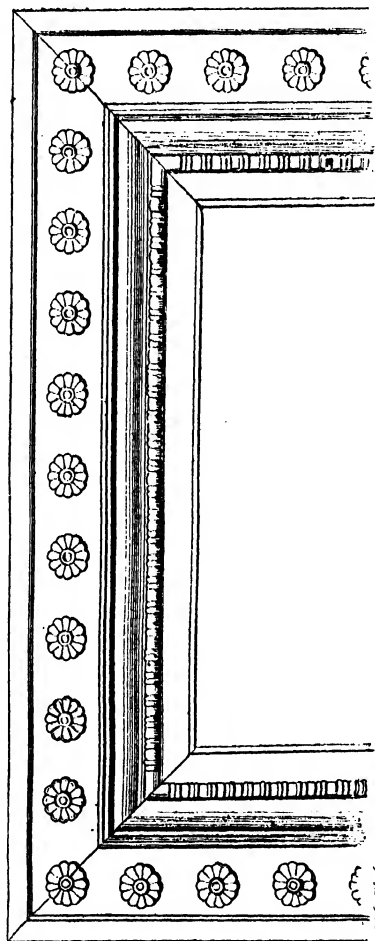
Fragment of a Door-Frame from a Hypostyle Hall. Sausa. (D.) (P. & C.)
